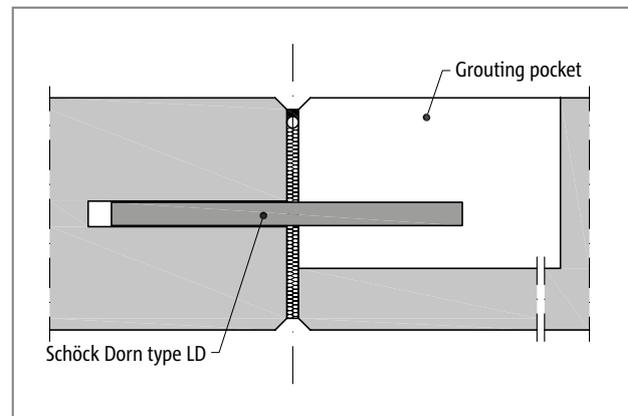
Schöck Dorn: Expansion joint formation precast concrete balcony
